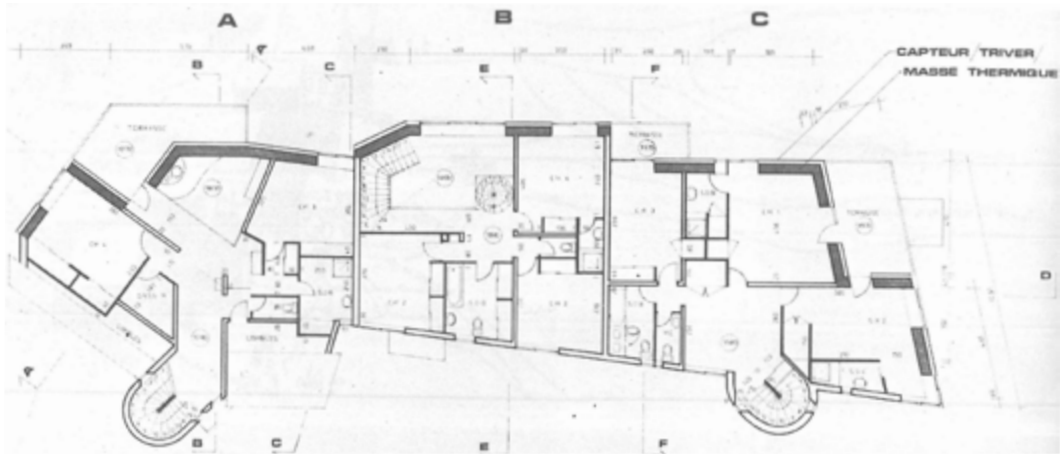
Single solar house in Odeillo. Detached house with Trombe wall, built in 1967 in Odeillo, France. (Architecture d'Aujourd'hui, 4/1977)
